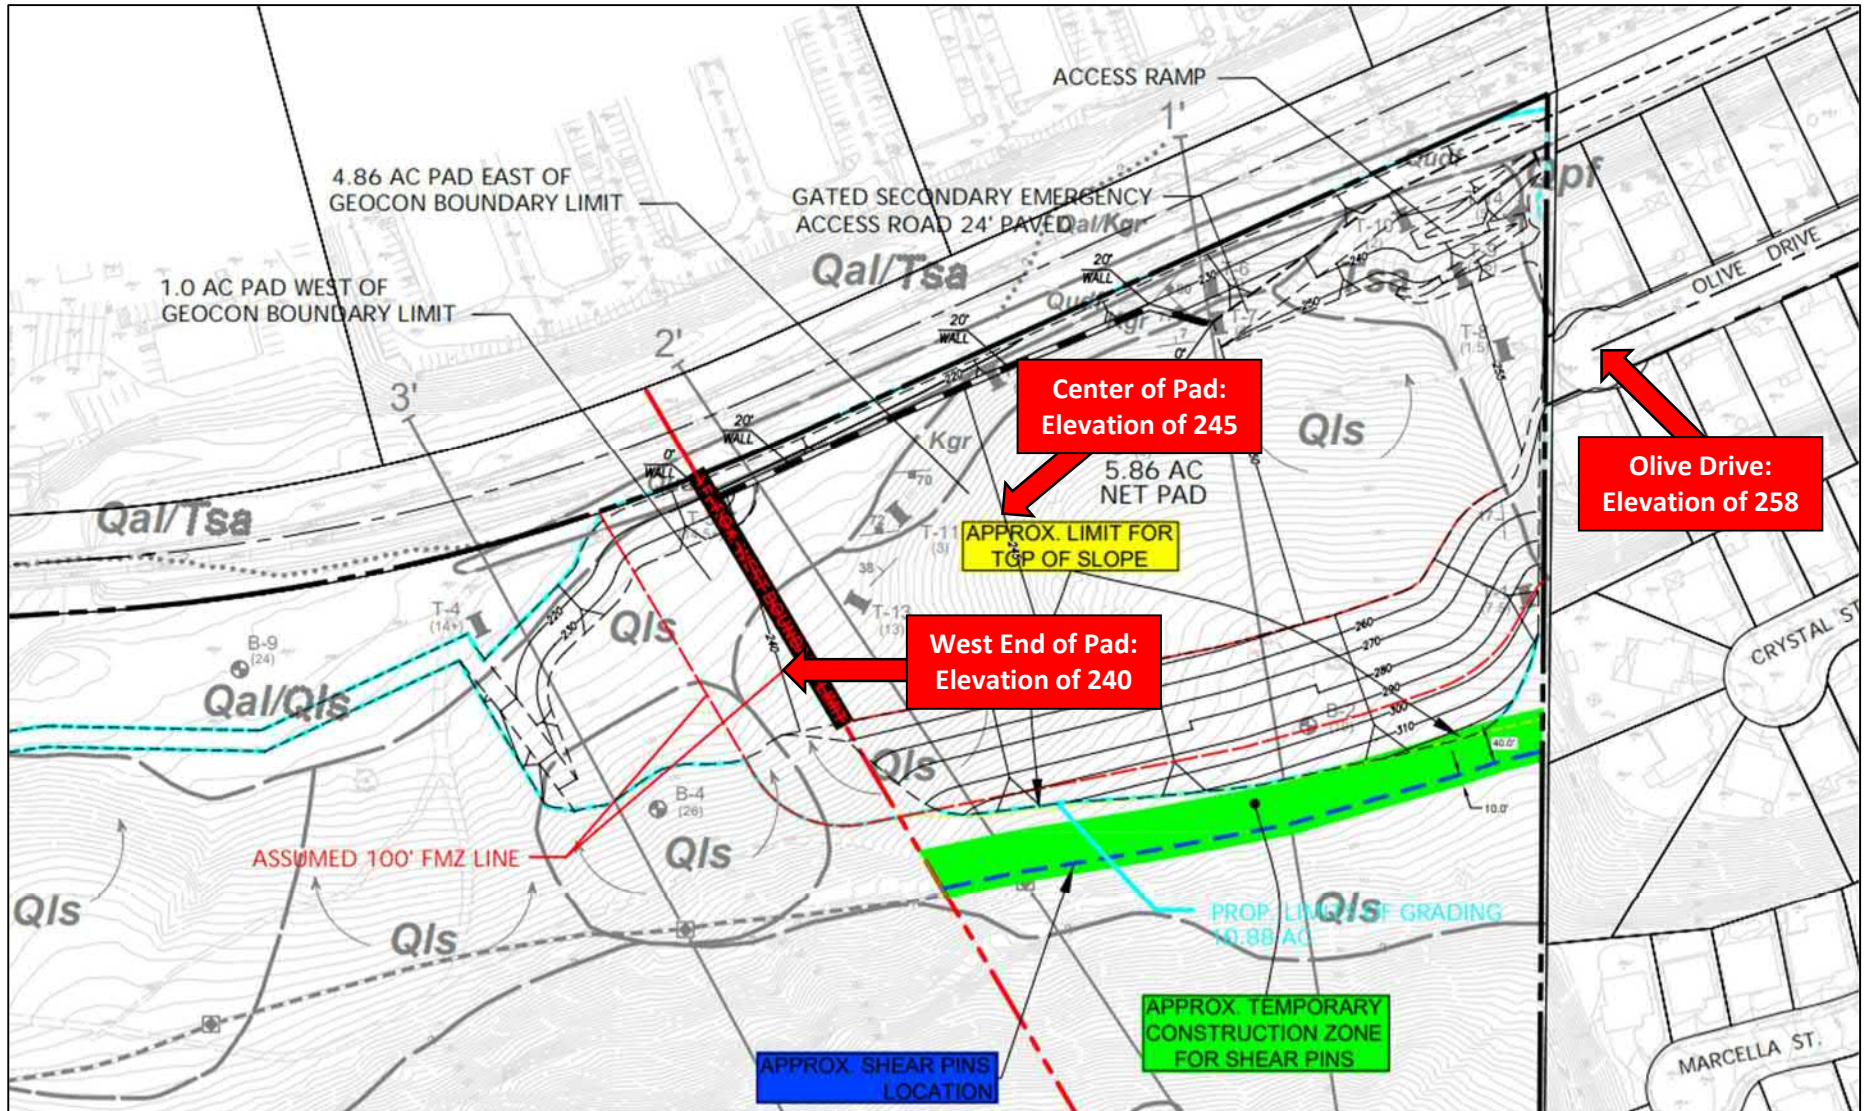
Exhibit A: Conceptual Site Plan and Proposed Improvements
